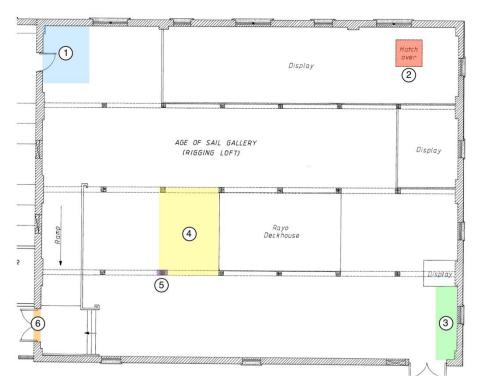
An annotated copy of the second floor plan, rear portion. North is to the top.
